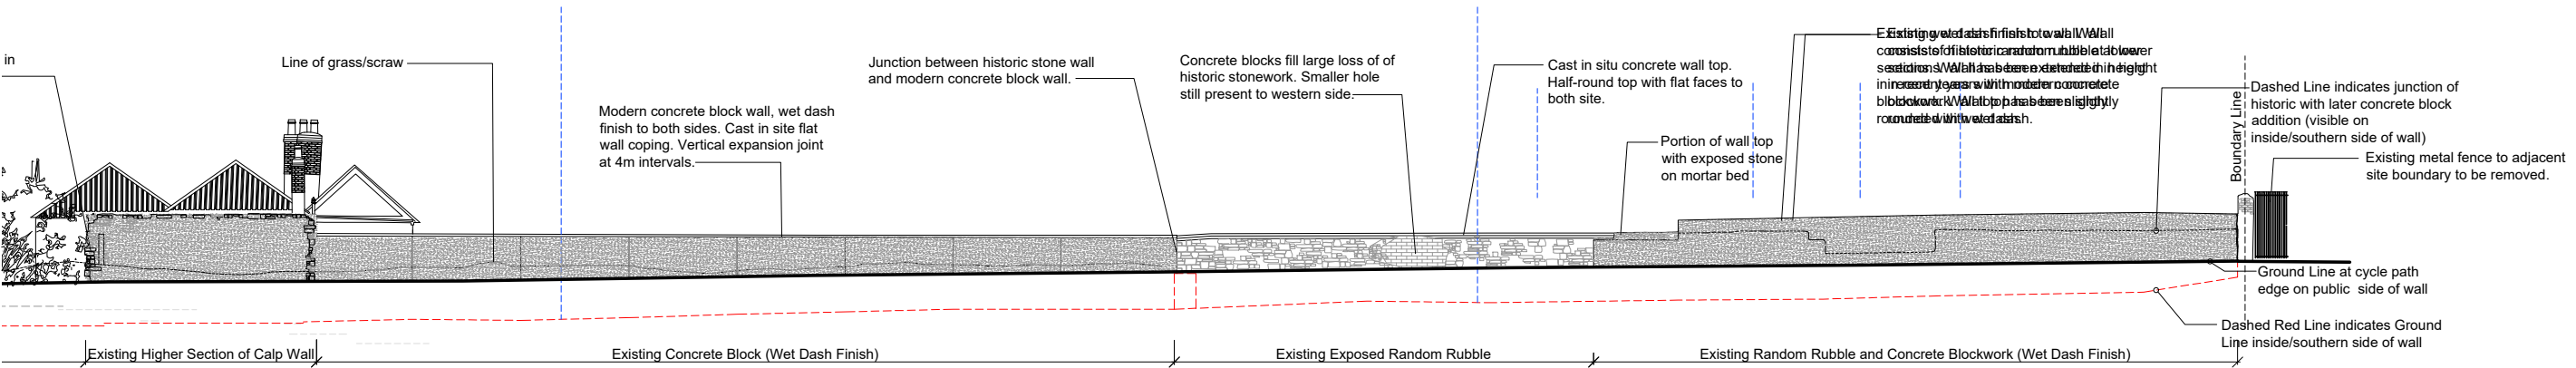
Elevation of the boundary wall from the Chapelizod Road
